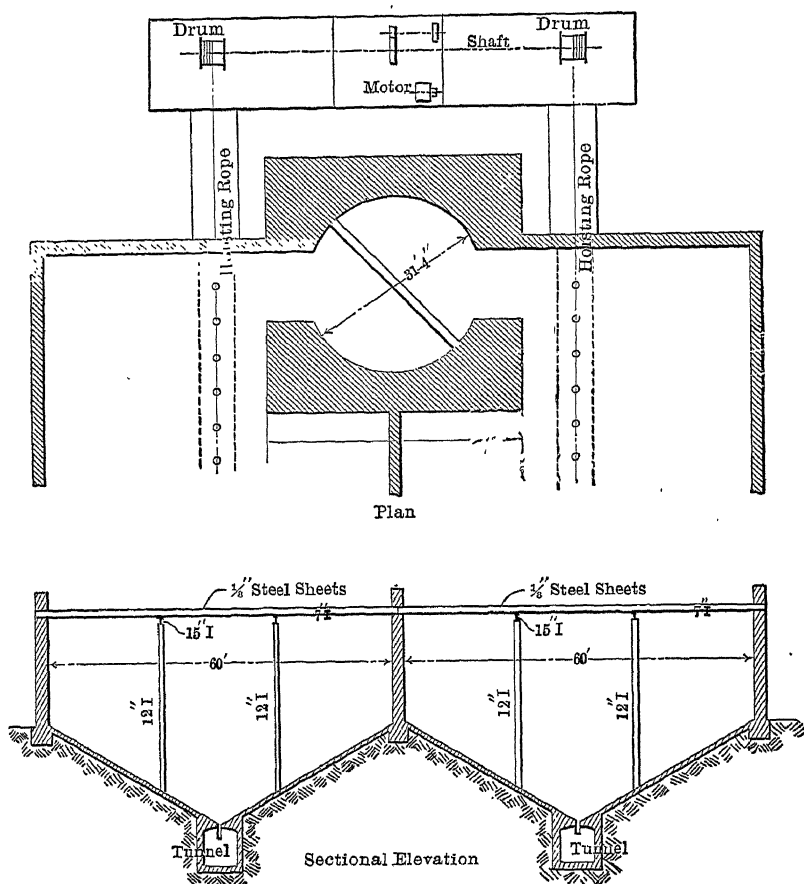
PLAN AND SECTIONAL ELEVATION OF MAIN DOUBLE FLUE.
